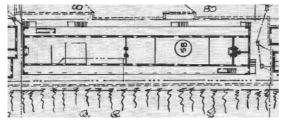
1961 G/F Plan, extracted from the 1961 Whitfield Barracks Skeleton Record Plan. (Source: PRO HKRS913-1-122
